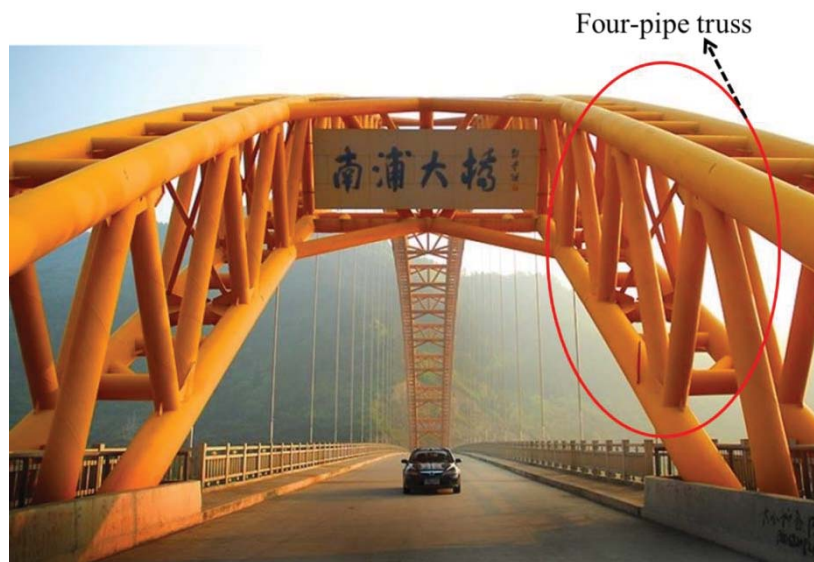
Typical Applications of CFT Members in Half-Through Arch Bridges
